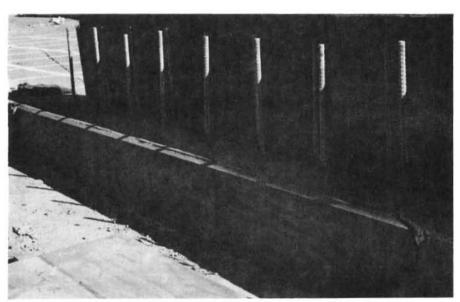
PHOTOGRAPHS OF CONSTRUCTION
